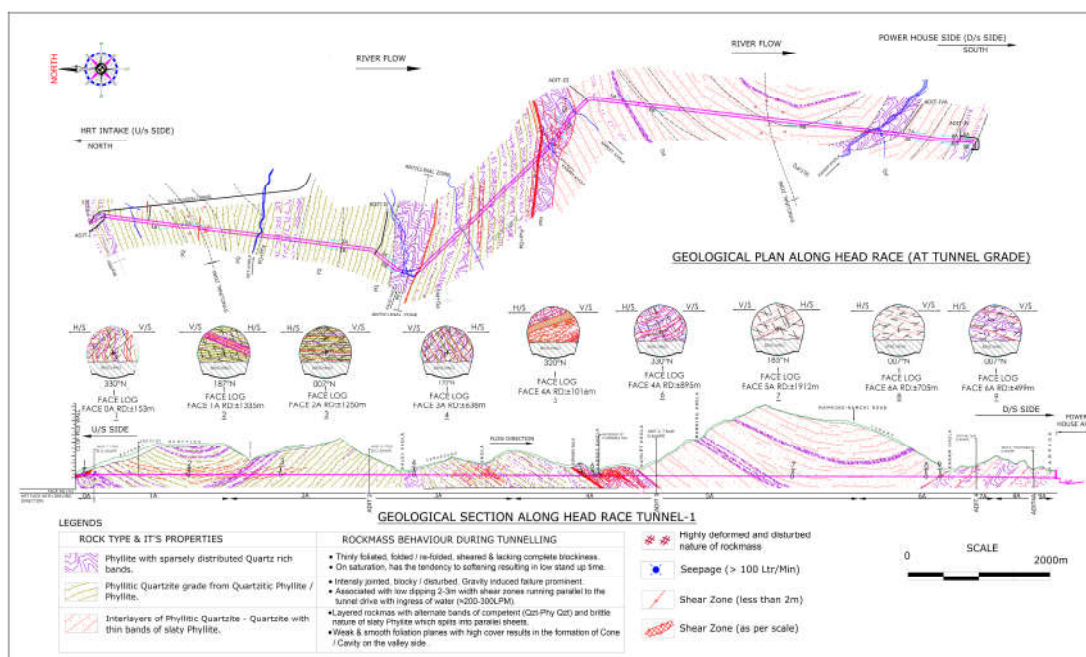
Geological Plan & section along Head race Tunnel (HRT) at Tunnel Grade of Teesta VI H.E. Project.
